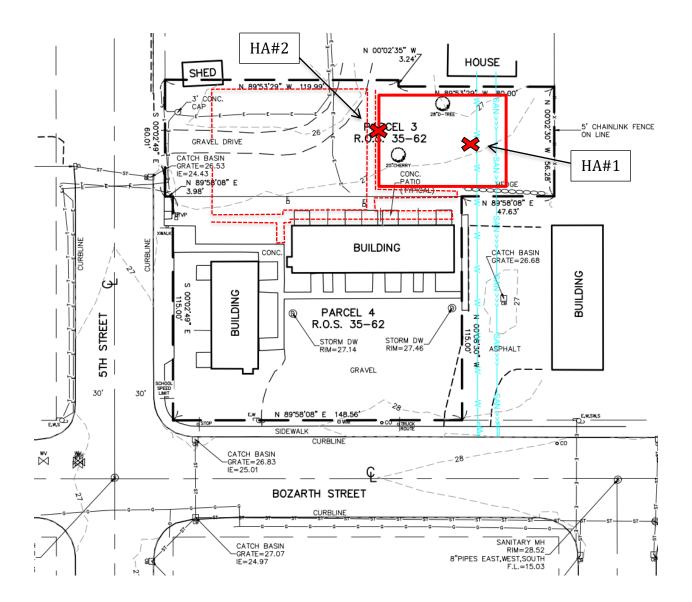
Subject site existing conditions as surveyed by Brown Surveying PLLC on 11-11-2021 and approximate boring locations with proposed building footprint, parking area and sidewalks.
